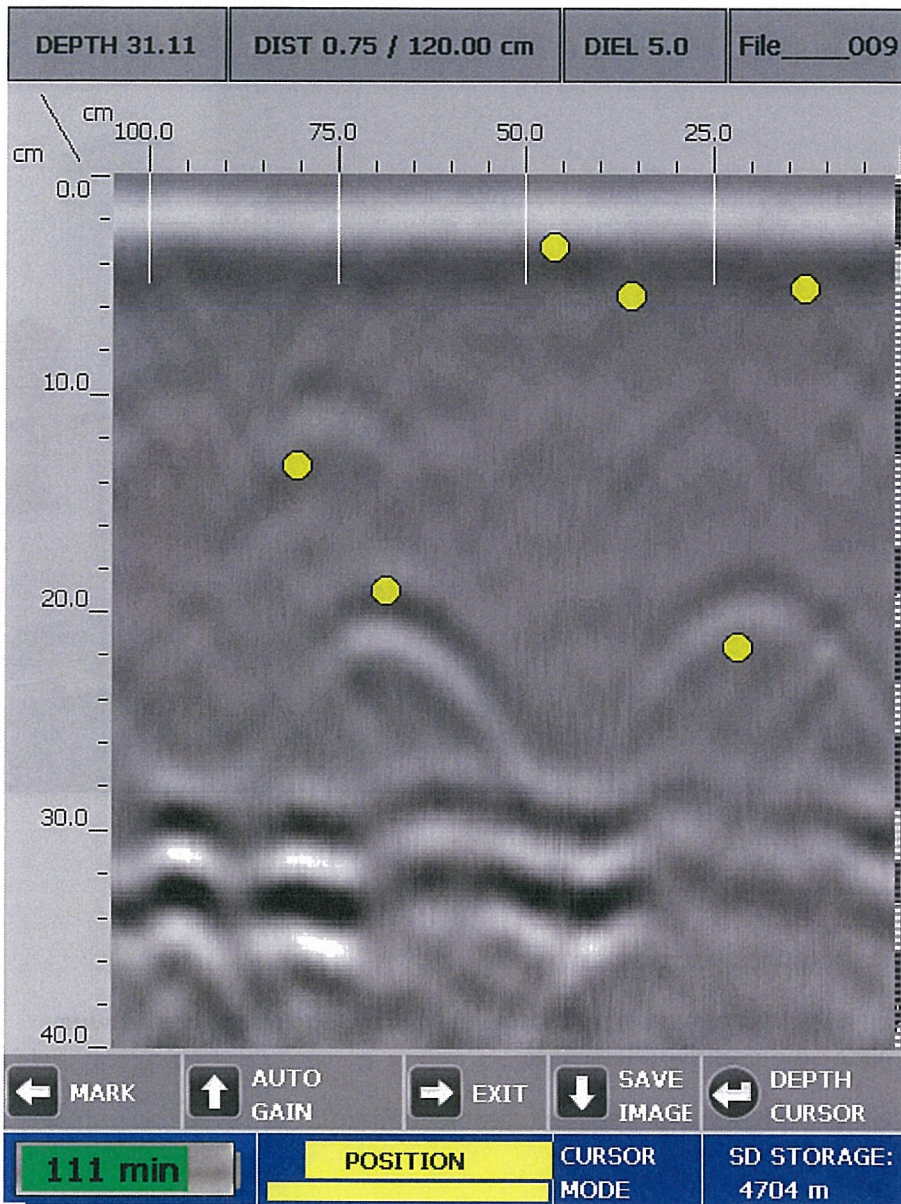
East Wall Vertical – showing internal wall lining at the bottom around 300mm
